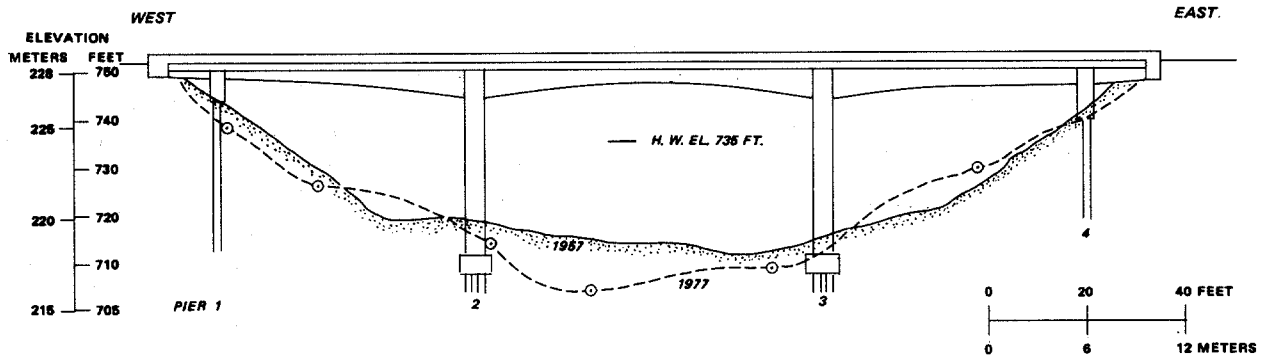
Elevation sketch of Lake Cushman bridge from original plans, with 1977 channel cross section added.
